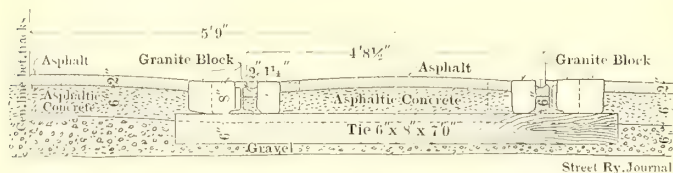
STANDARD TRACK CONSTRUCTION ON PAVED STREETS
